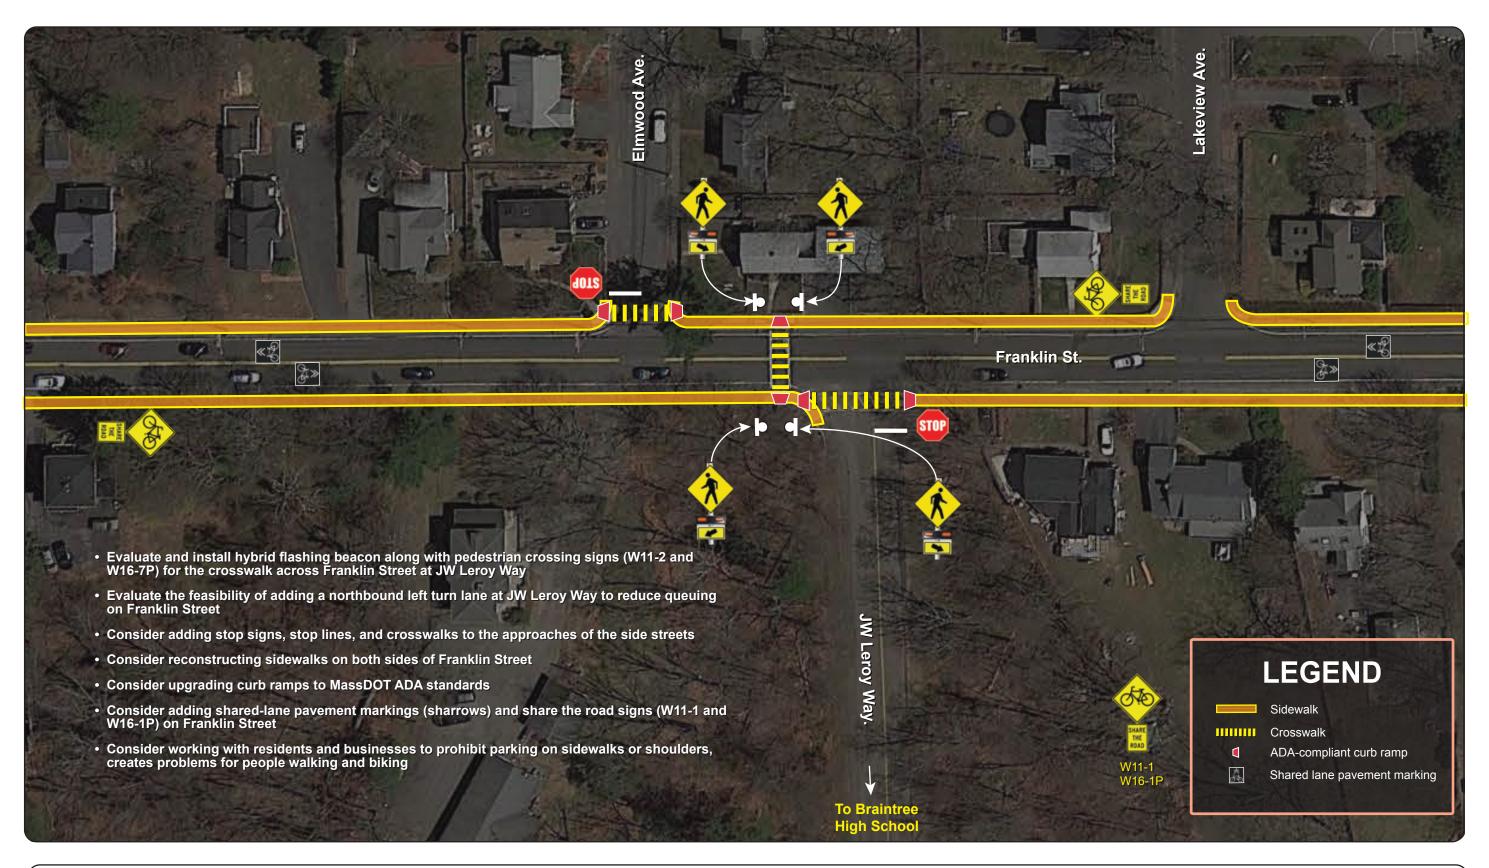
Proposed Improvements Franklin Street at J.W. Leroy Way
